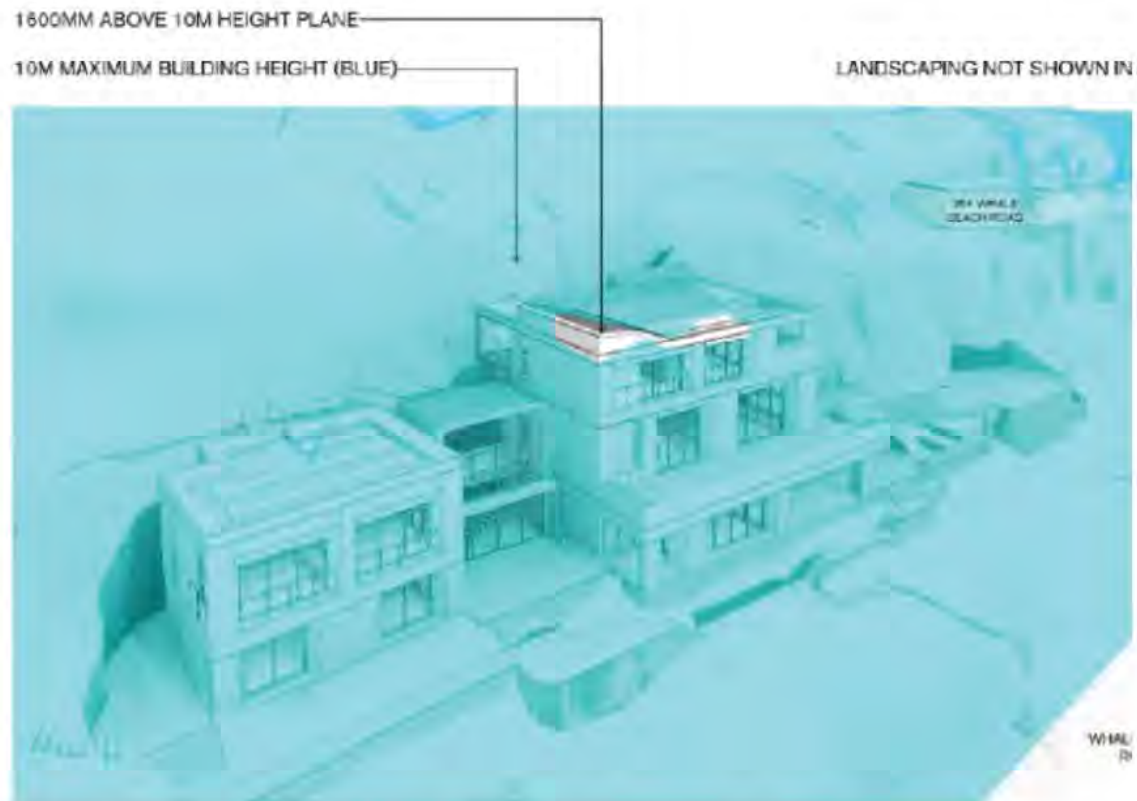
Extract of 3D View of Proposal with 10.0m Maximum Building Height Plane (Source : City Plan SEE)
